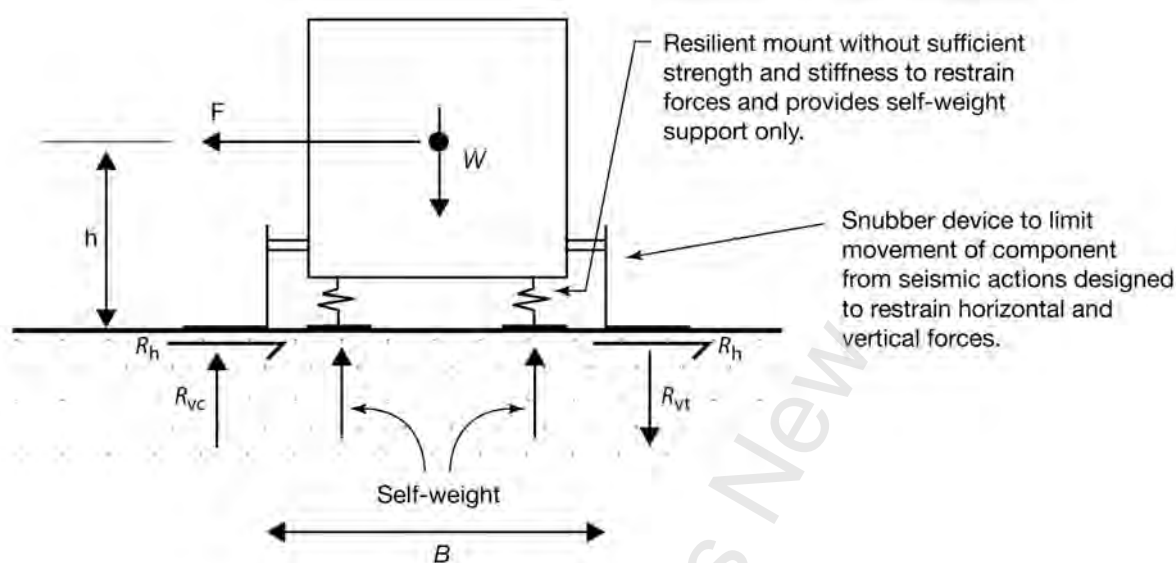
Forces on floor-mounted components using type 2 mounts with snubbers
